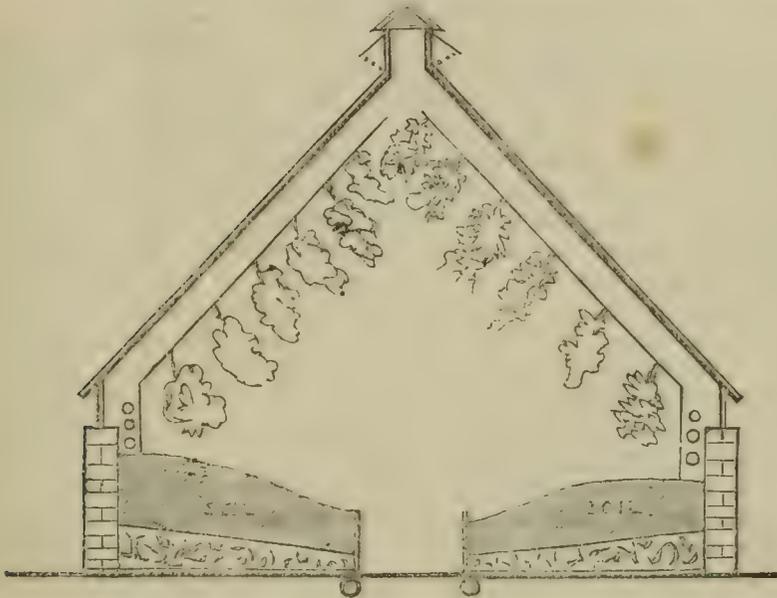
SPAN-ROOF VINERY, WITH INSIDE BORDERS.
